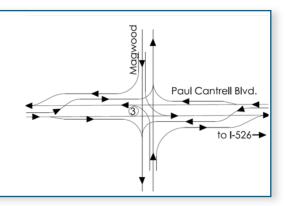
Paul Cantrell Boulevard at Magwood Drive Alternative 7
